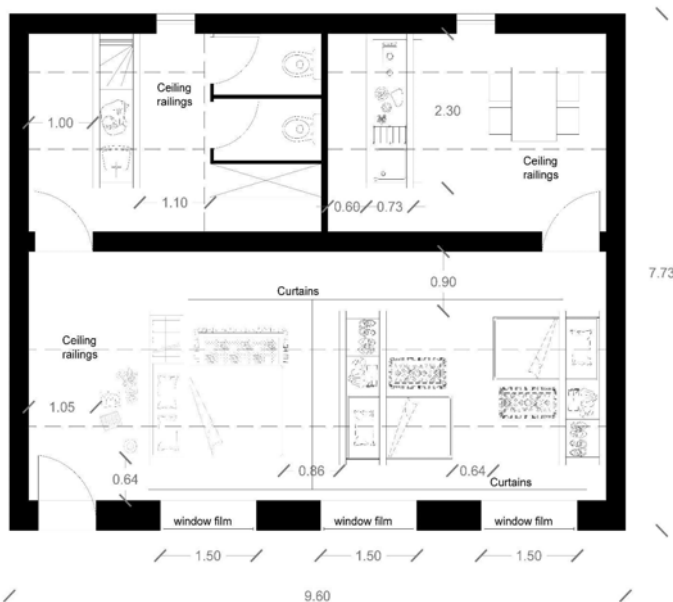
Shop-Hopping Box – Ground floor plan<sup>62</sup>
